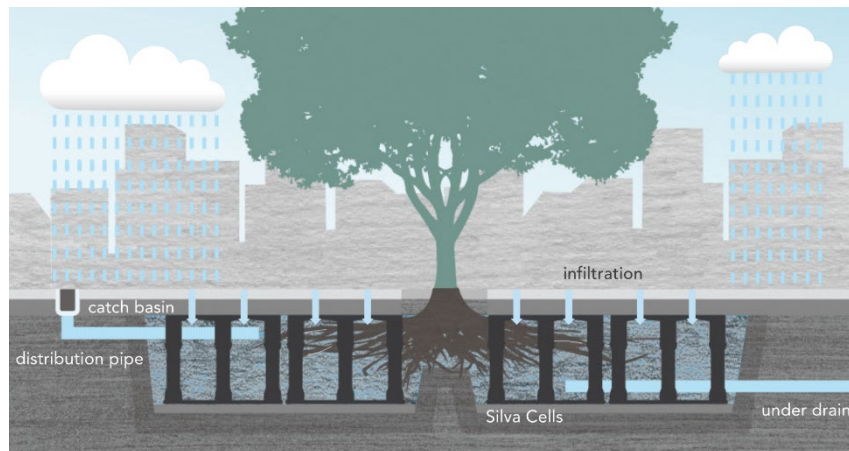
Diagram of Silva Cells under pavement. (Deeprout, 2018)
